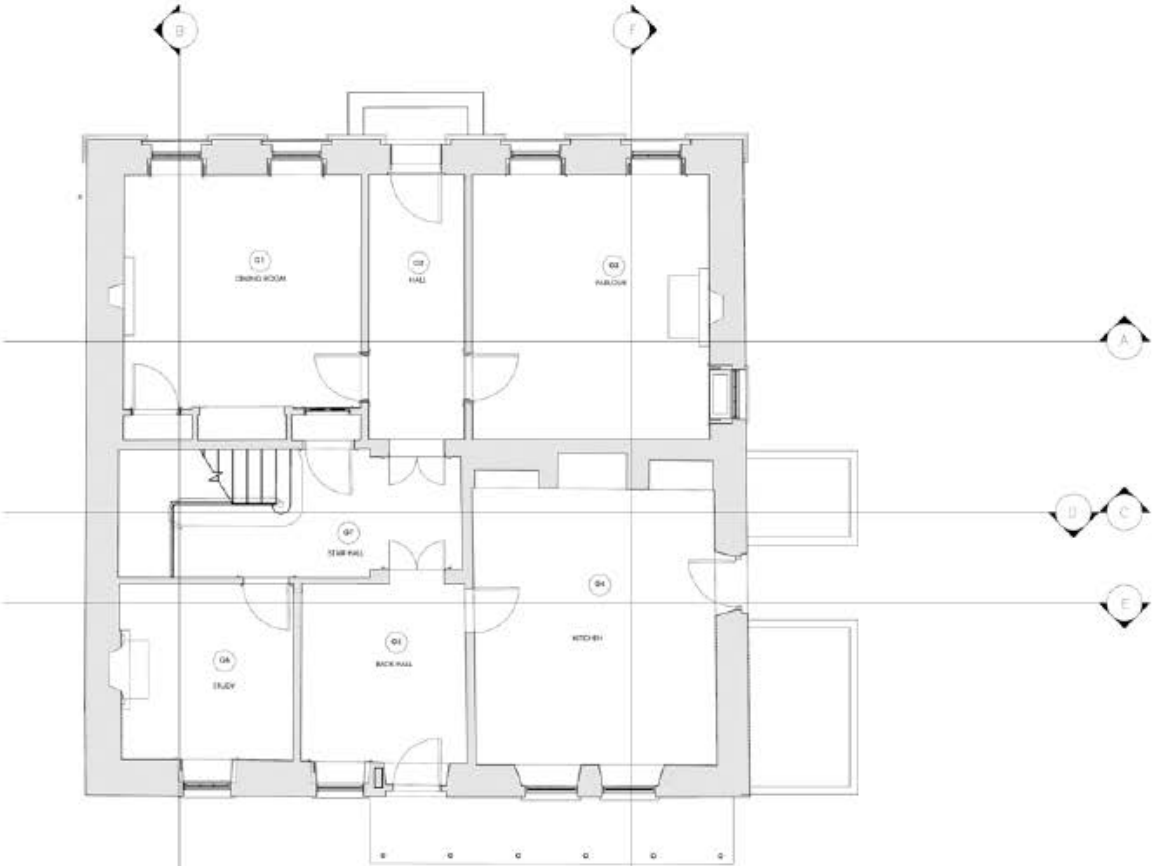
Belmont: Reconstructed plan of ground floor in Period 1-2 (James Hall)
